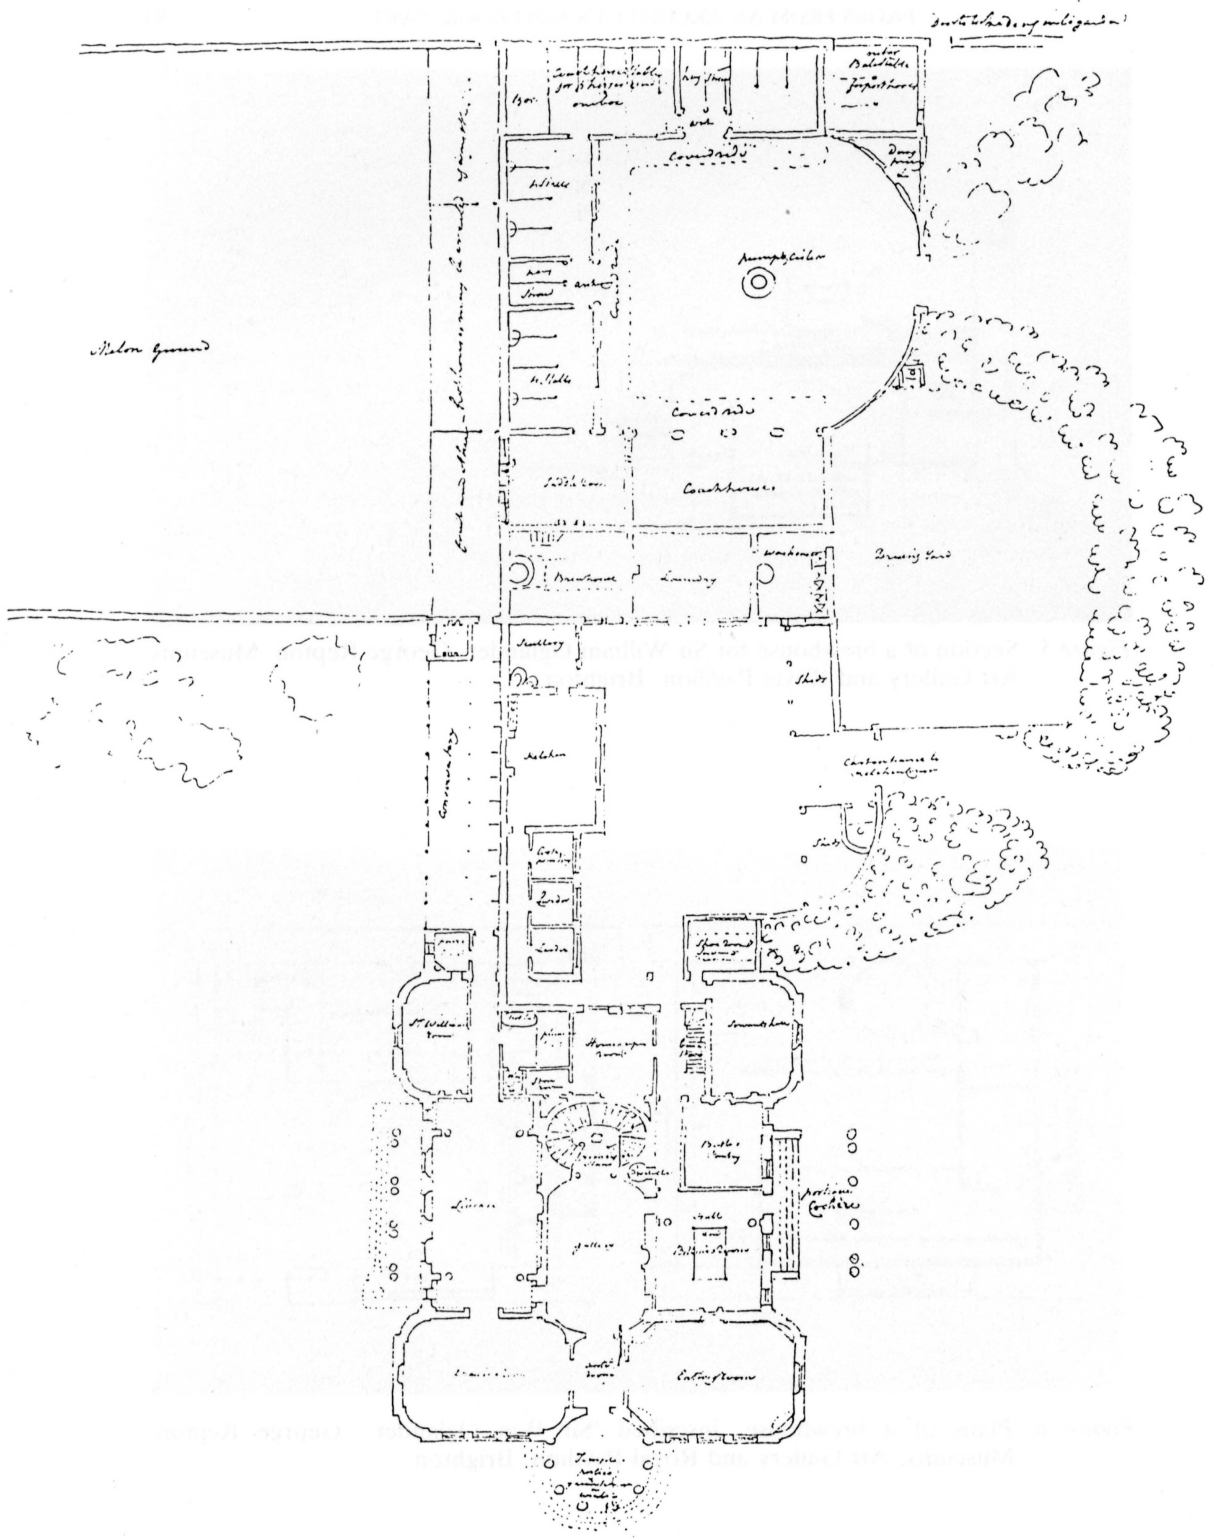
Plan for a large country house, inscribed 'Mr. Nash's plan for a House at Nunwell.-'. Isle of Wight Record Office OG87/21H.
